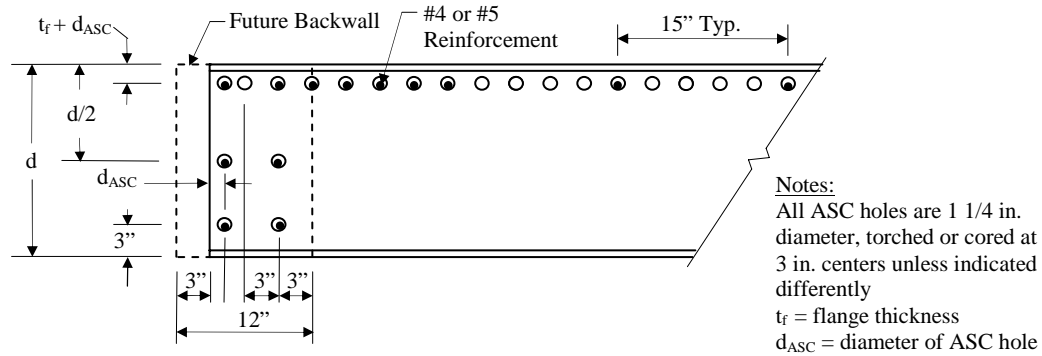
ASC and backwall hole layout for the selected W27x129 section.
